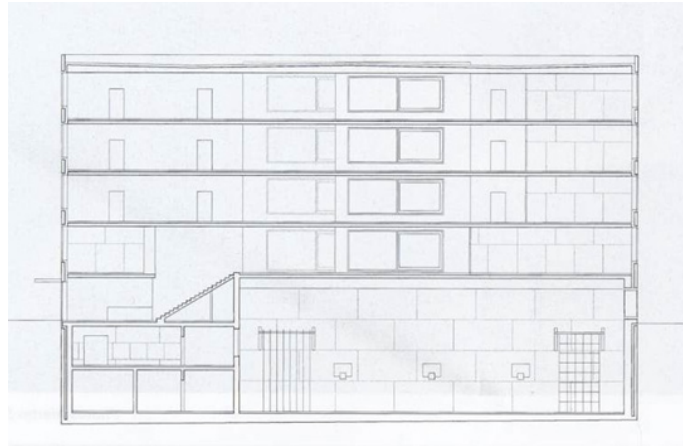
Cross section of the Volta School in Basel (drawing by Miller & Maranta)
